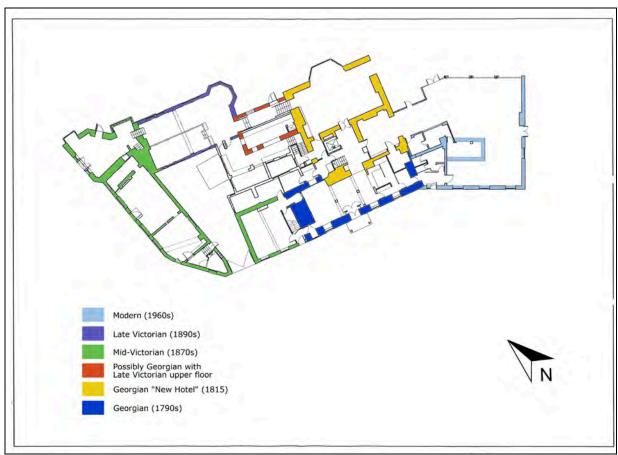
A ground floor plan of the hotel showing the phases of the complex as presently understood.
